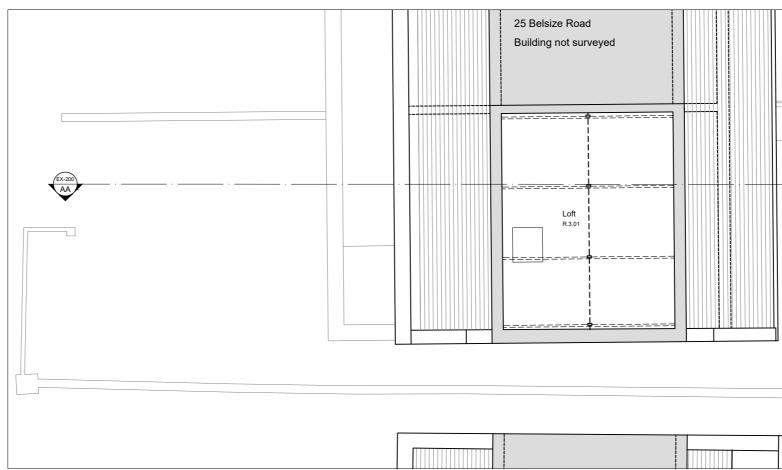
Existing Loft Plan - Scale 1:100 @ A3
